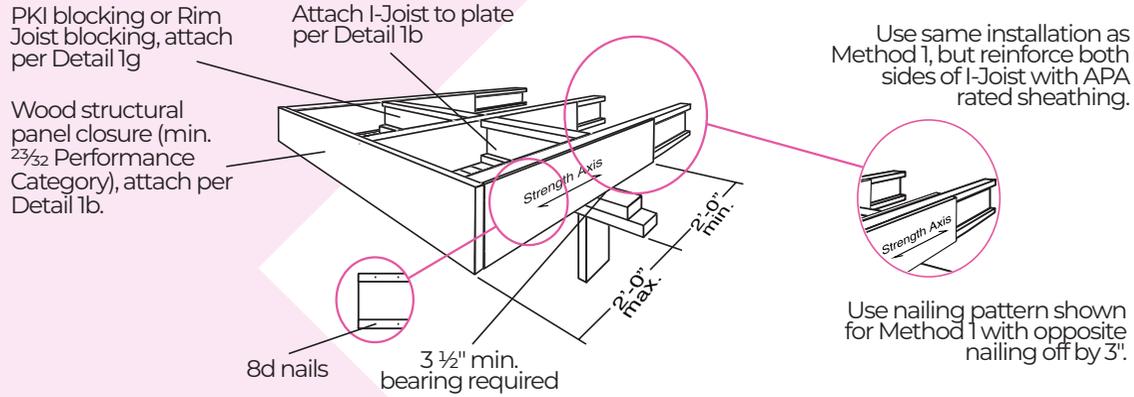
CANTILEVER DETAIL FOR VERTICAL BUILDING OFFSET
